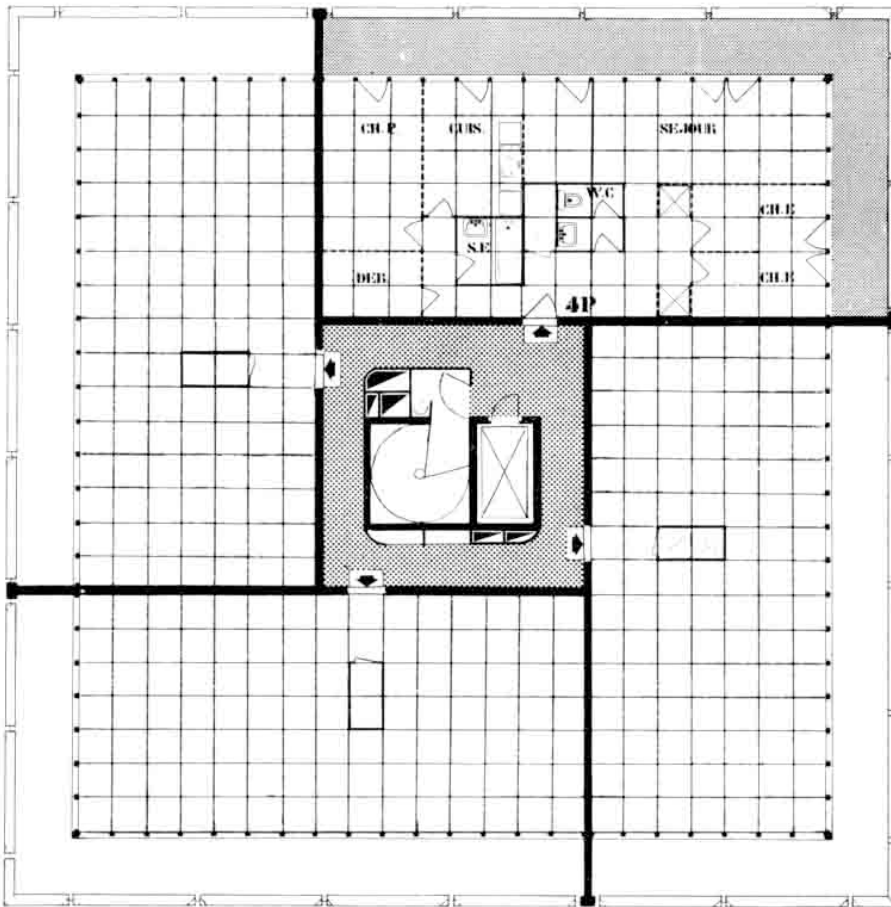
Typical floor plan of apartment building at Montreau by Xavier and Luc Arsène-Henry (Source: *Techniques et Architecture*, no. 292 “Architecture évolutive: Habitation” (1973): 95). Each floor consisted of four units placed around a central core containing vertical circulation. Apart from the utilities duct in the center, the units themselves were freed from constraints.
